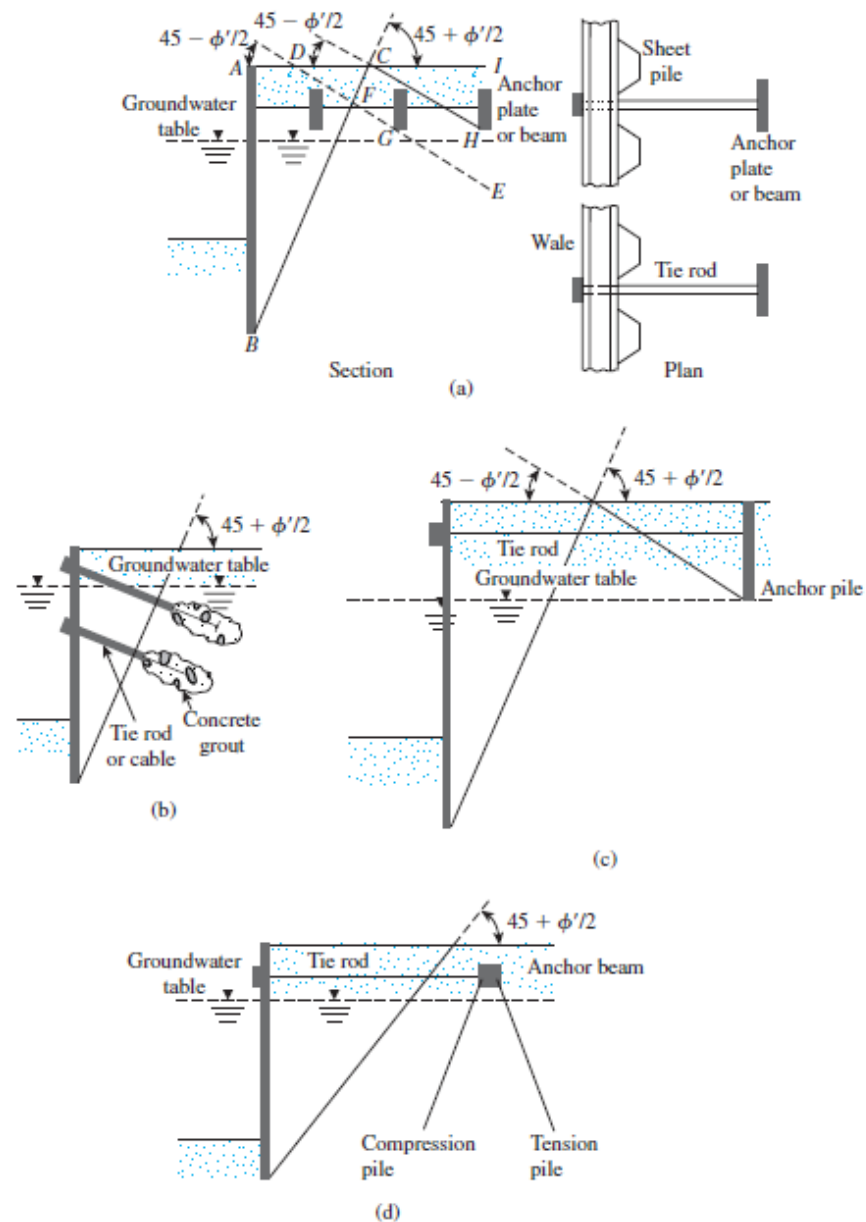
Various types of anchoring for sheet-pile walls: (a) anchor plate or beam; (b) tieback; (c) vertical anchor pile; (d) anchor beam with batter piles
